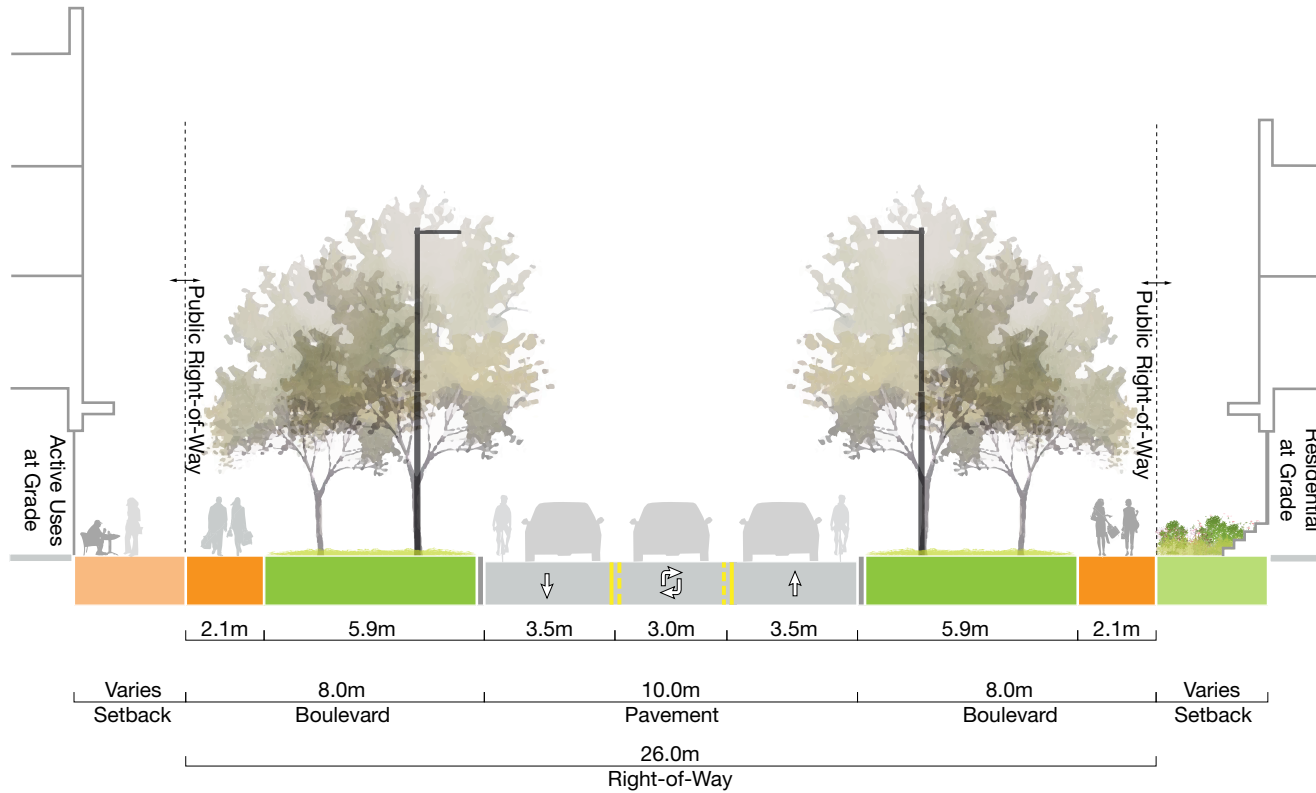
Childs Drive (Typical 26m Right-of-Way Cross Section)
